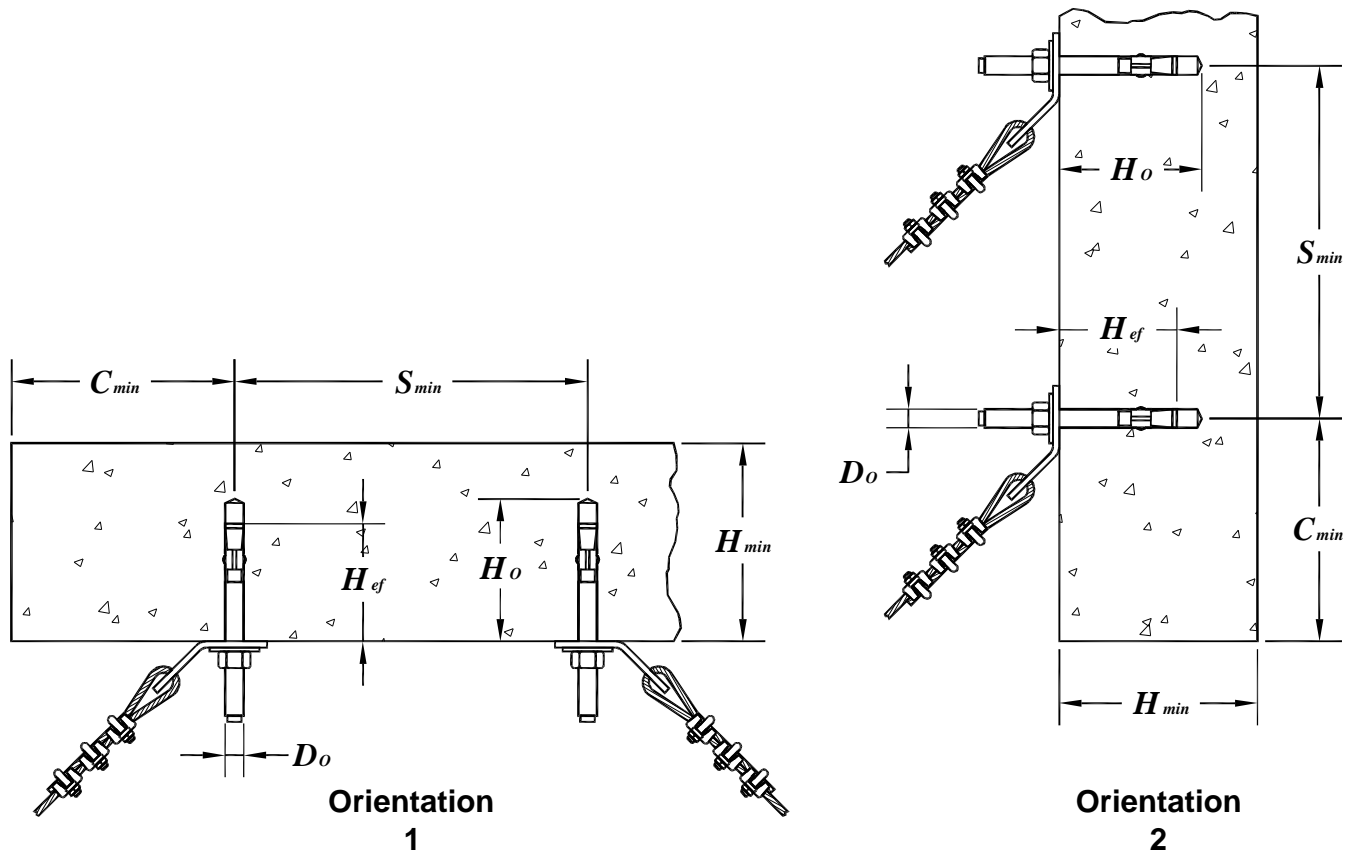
; Typical KSCC Bracket Installation in Normal Weight Concrete
